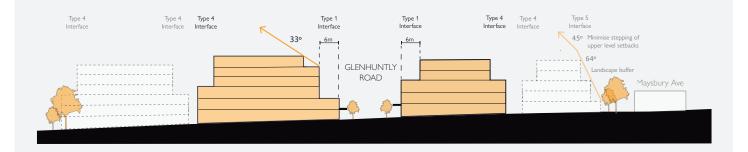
Cross section view of Glenhuntly Road looking west from Orrong Road.
